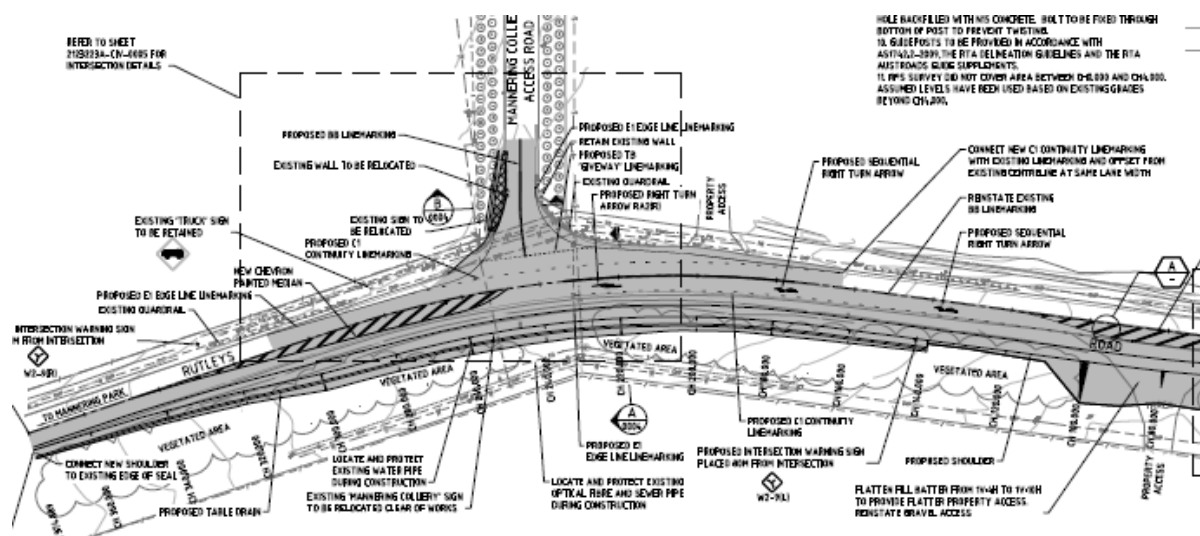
Detailed Design of Proposed Intersection Upgrade
